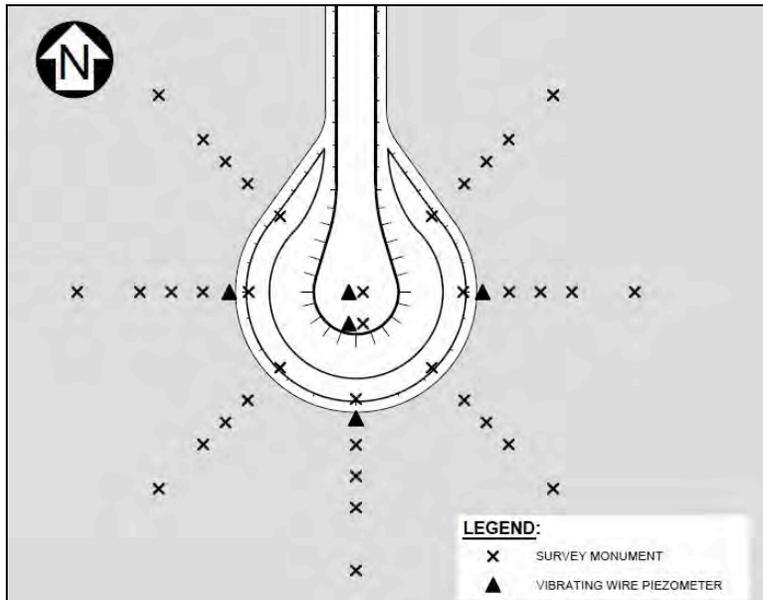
Schematic plan view of Test Pad Constructed over Tailings Slimes
